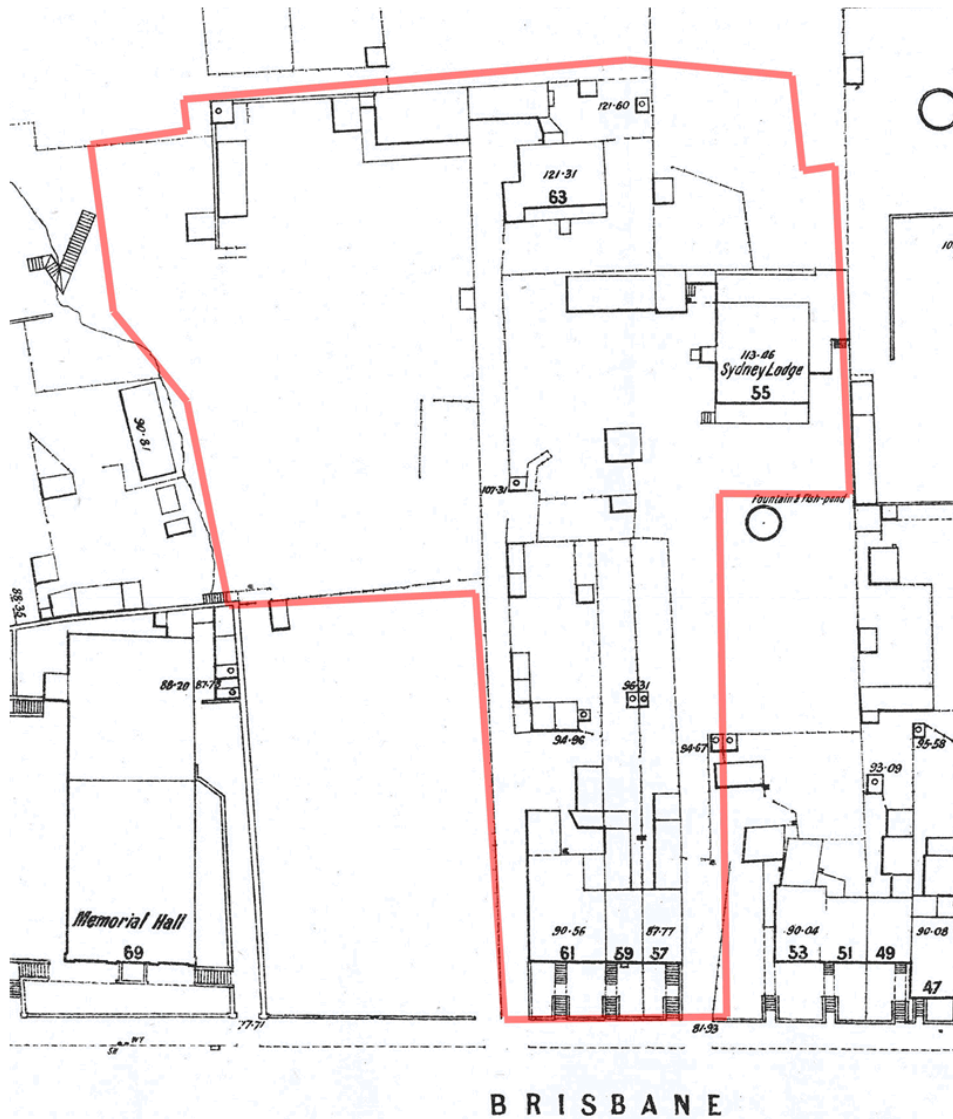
Level data from the 1908 Metropolitan Drainage Board plans.
